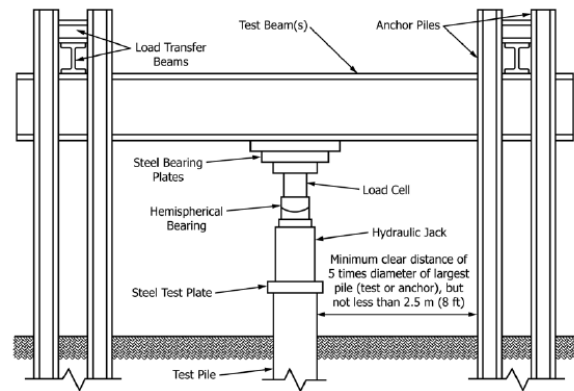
Schematic of Hydraulic Jack Acting Against Anchored Reaction Frame (ASTM Designation: D1143/D1143M-07, 2013)
